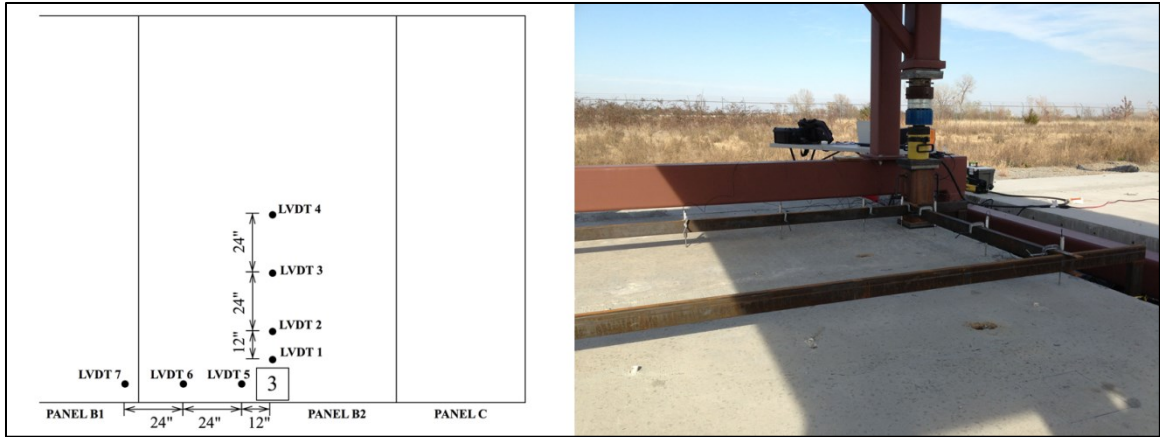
Instruments Layout at Test Location 3 at Panel B2. Test Location 3 is located at the edge of Panel B2, which is supported by the thickened edge beam.
